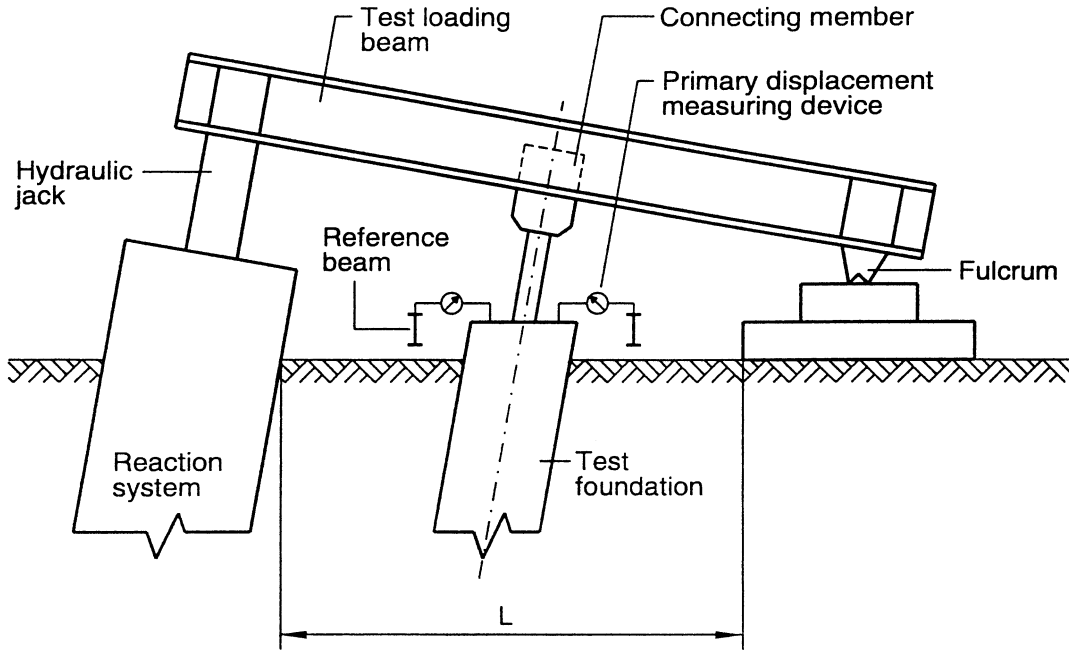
Load application by means of hydraulic jack and fulcrum beam
